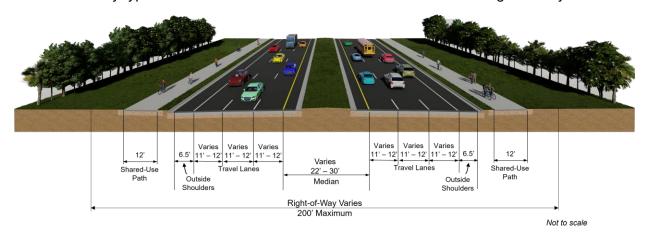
Preliminary Typical Section for Six-Lane Roadway
